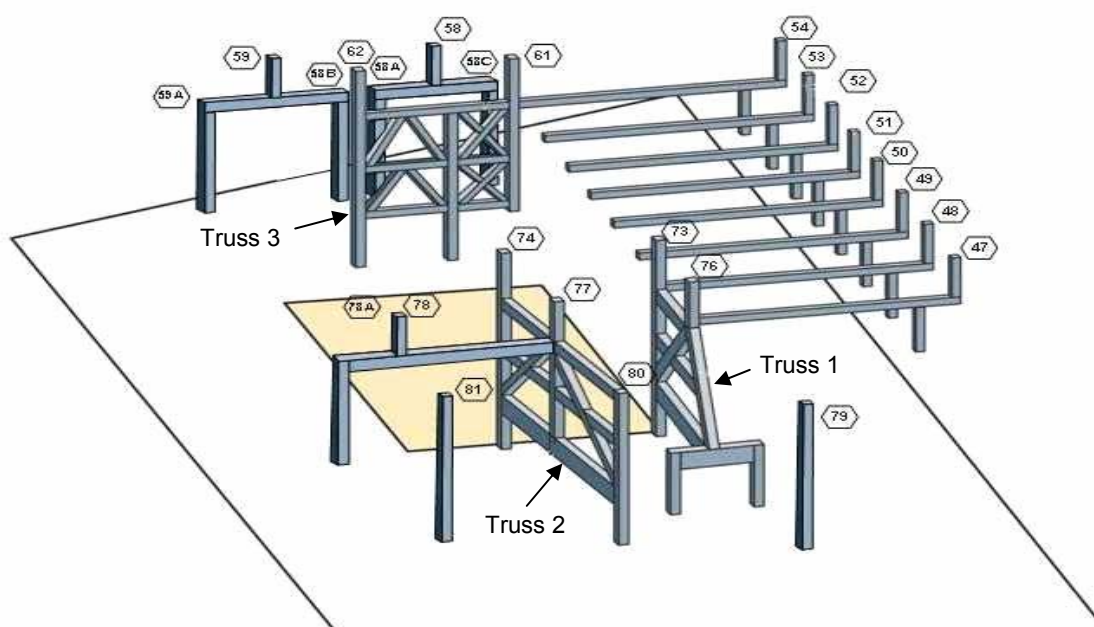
3D schematic view of transfer trusses and girders between Floors 5 and 7.
